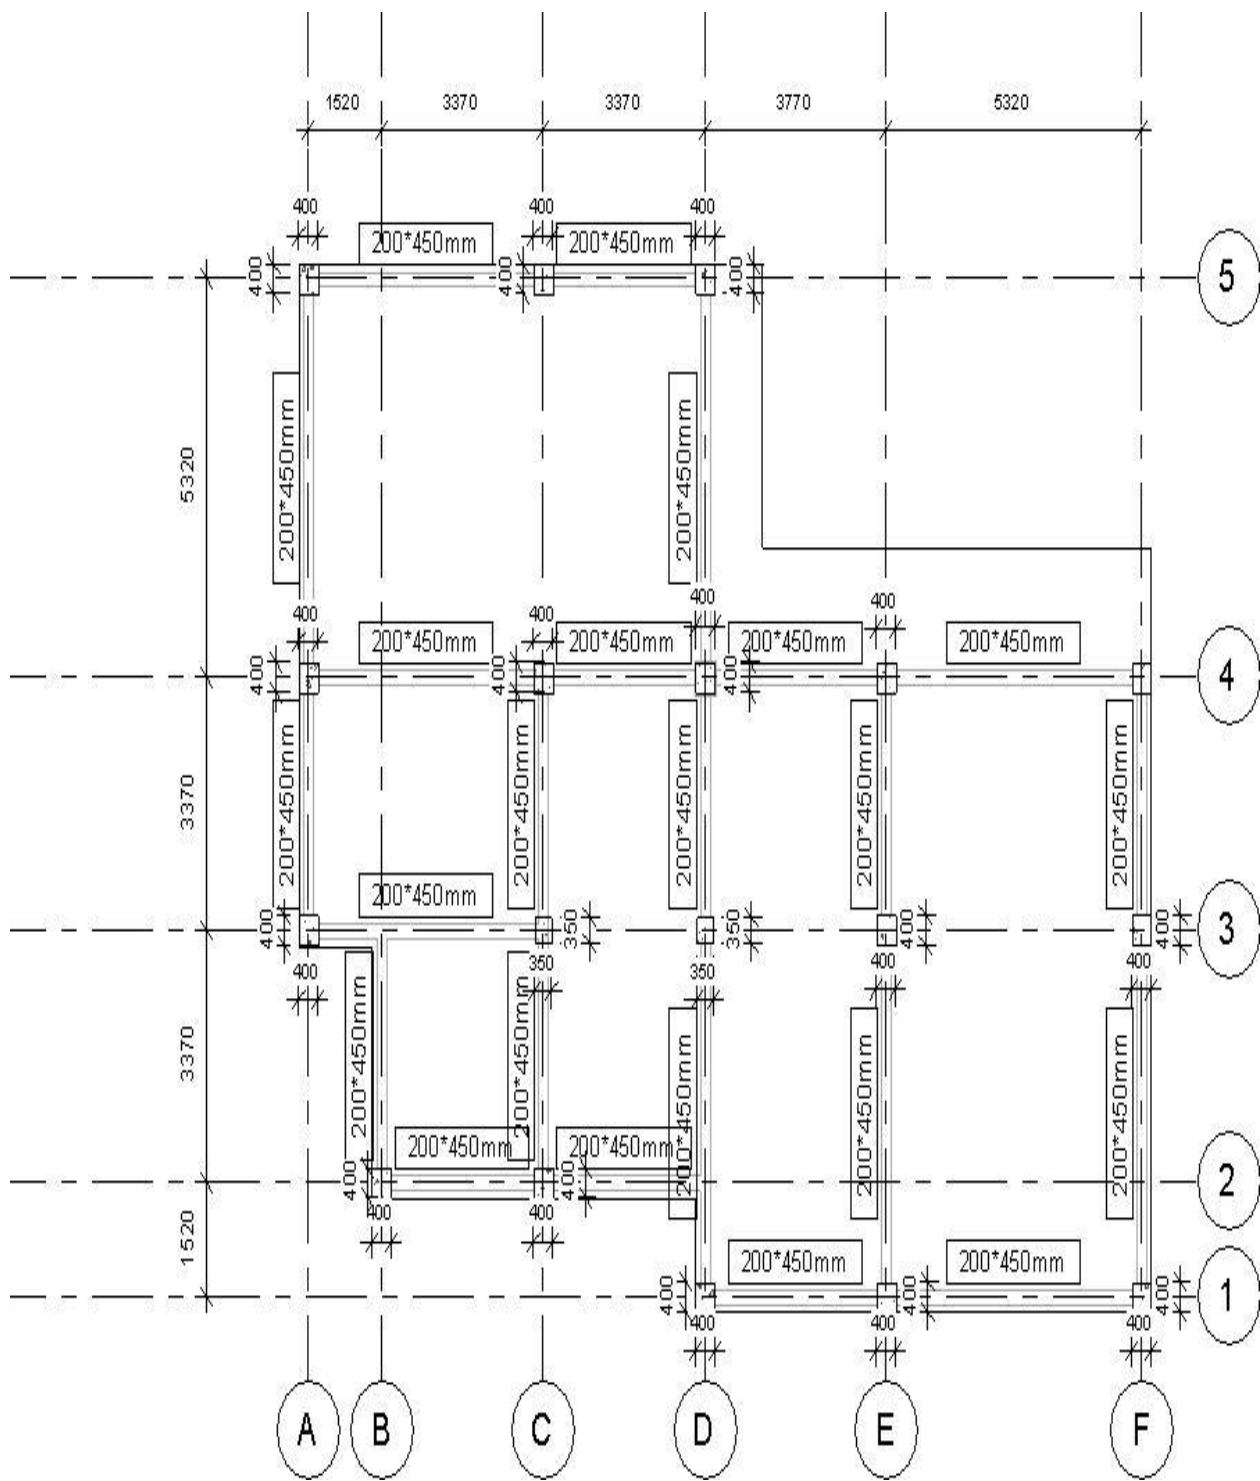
Typical structural Floor Plan in Revit Structure (1<sup>st</sup>-4<sup>th</sup> floor)
